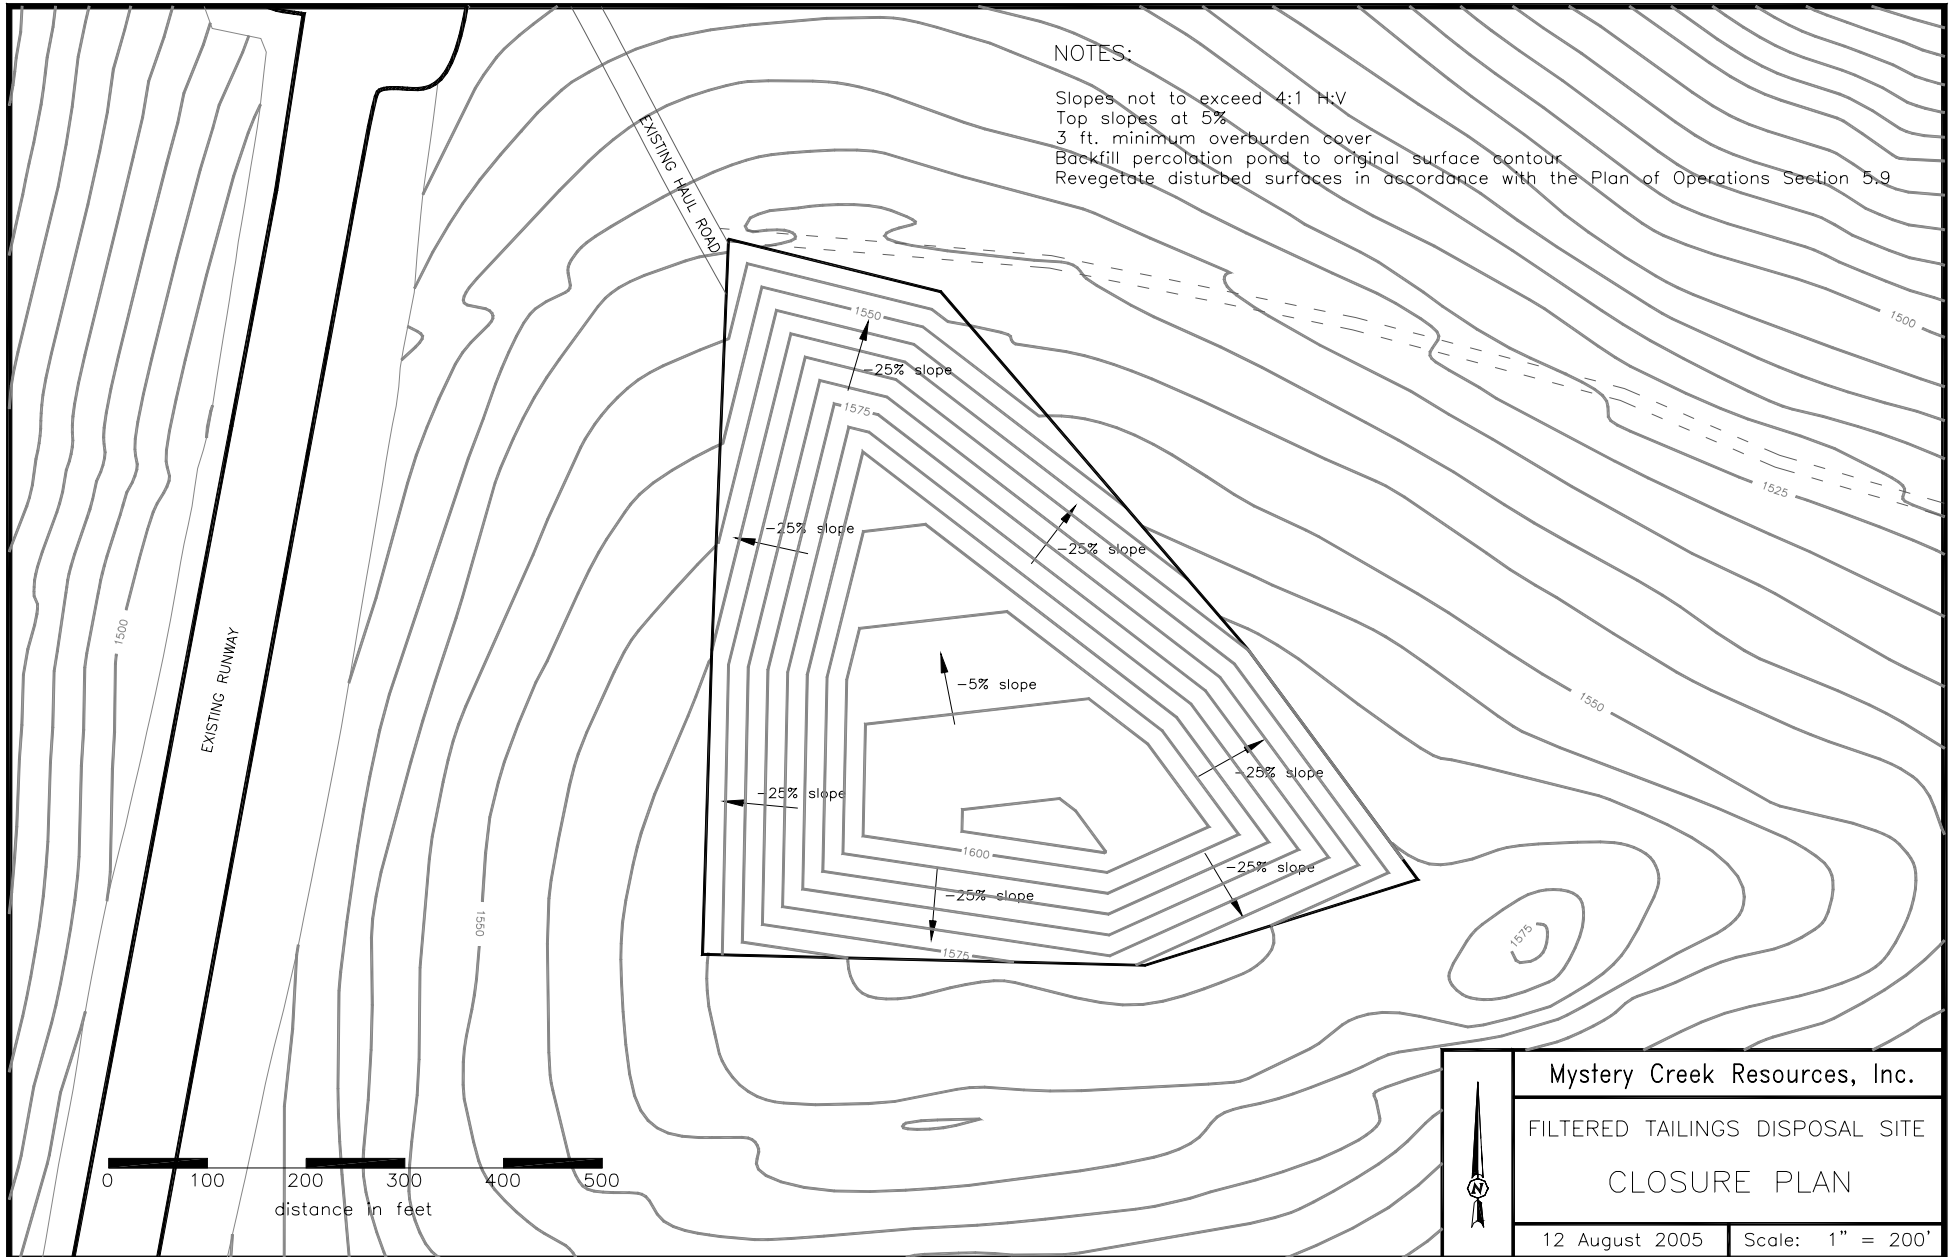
FILTERED TAILINGS DISPOSAL SITE CLOSURE PLAN
